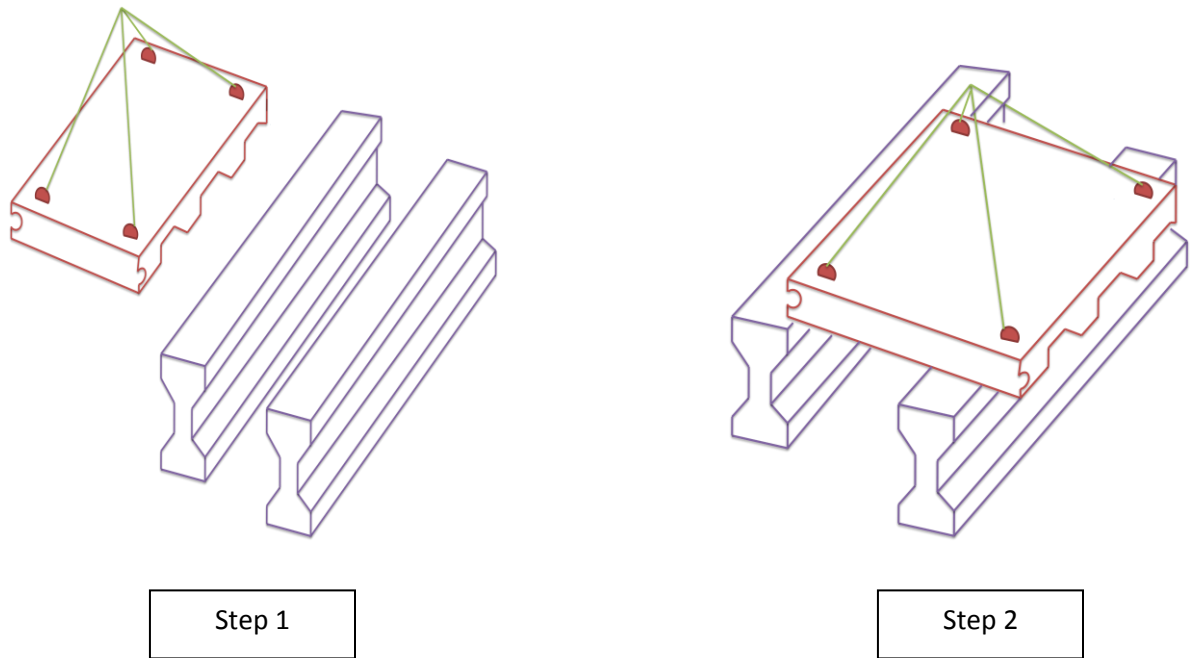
Lifting & Placement of a Panel on Supporting Girders
